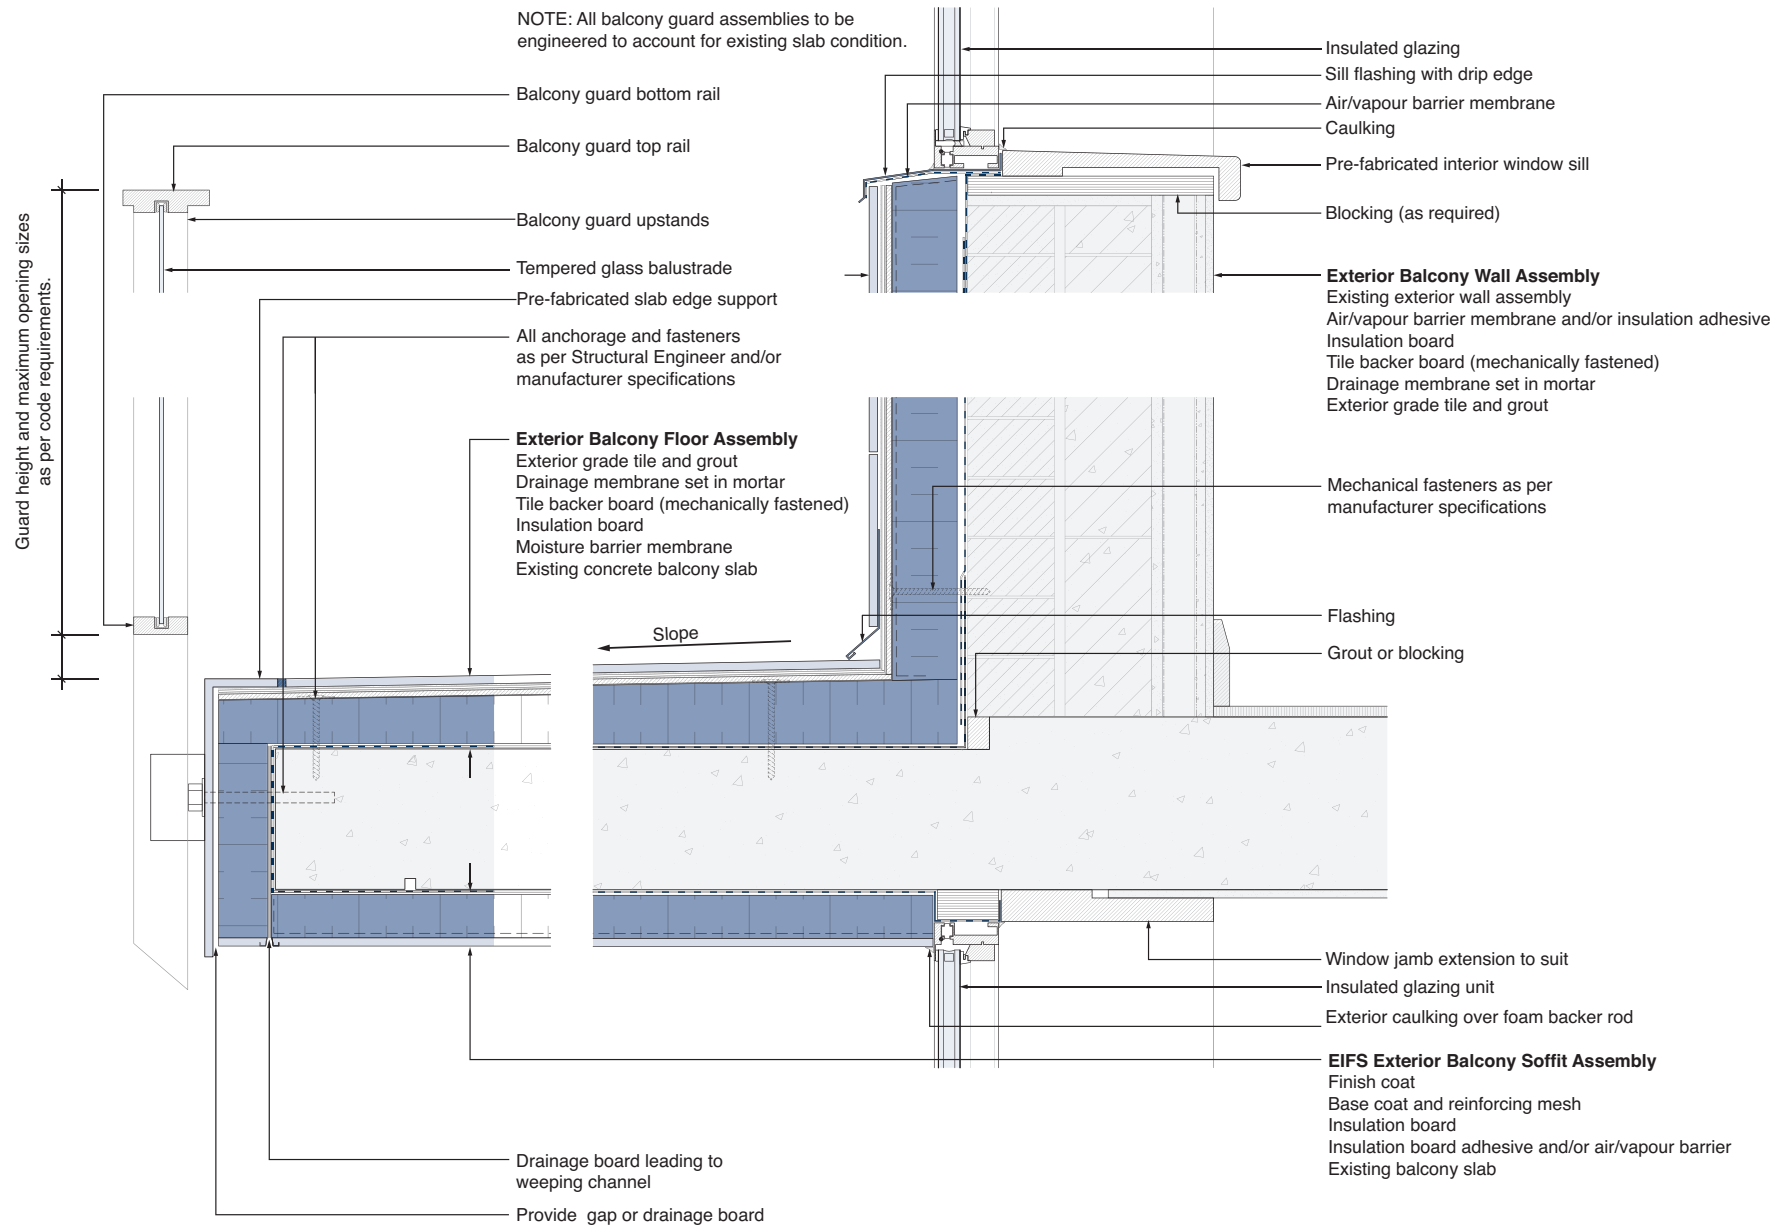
Section through balcony slab overcladding indicates the use of a tile product as an exterior wall finish and floor traffic surface. Multiple lines of defence against moisture migration are essential for long term durability. The thermal resistance of the insulation material for the slab edge and floor areas should not decrease appreciably under wet conditions. All materials should be corrosion resistant and capable of withstanding freeze–thaw cycles. Alternative products and assemblies providing equivalent wear resistance and durability may be substituted for the tile cladding assembly. Note the use of a combined insulation adhesive and air/vapour barrier to attach the insulation to the existing wall.
